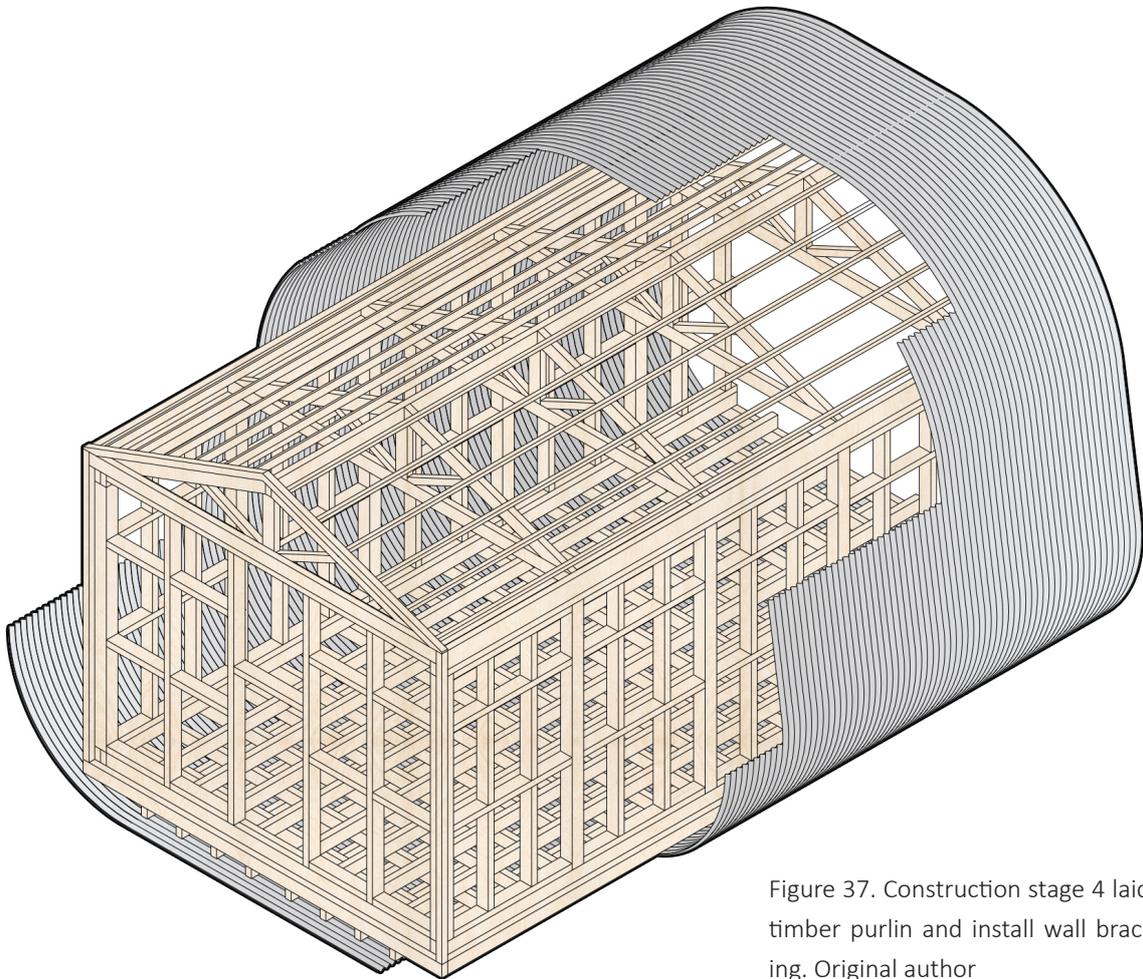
Construction stage 4 laid timber purlin and install wall bracing. Original author
